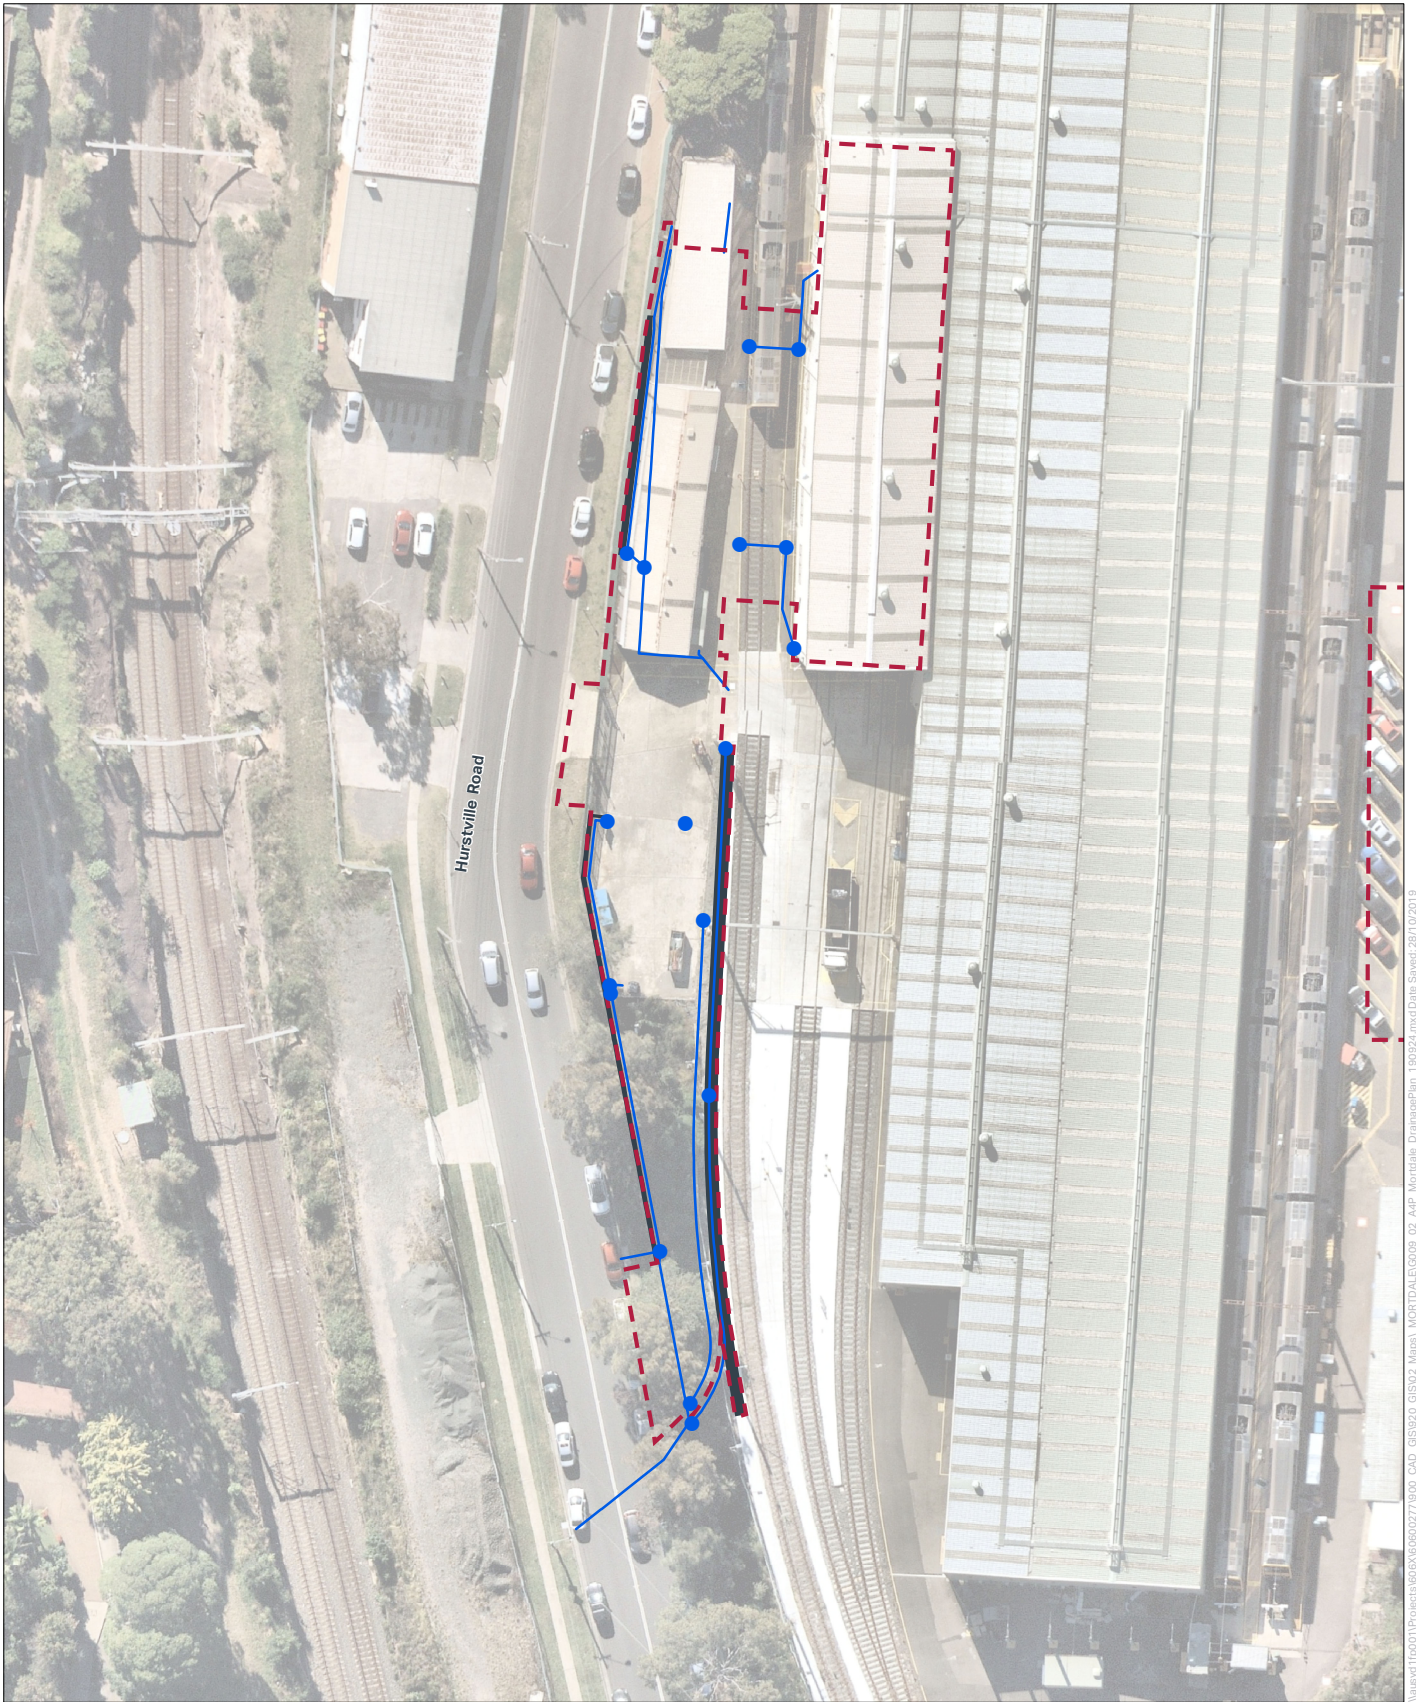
PROPOSED RETAINING WALLS, DRAINAGE AND PITS AS PART OF THE PROPOSAL
